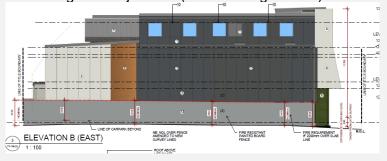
East elevation extracted from the current endorsed plans for the hospital development on the adjoining western property.
